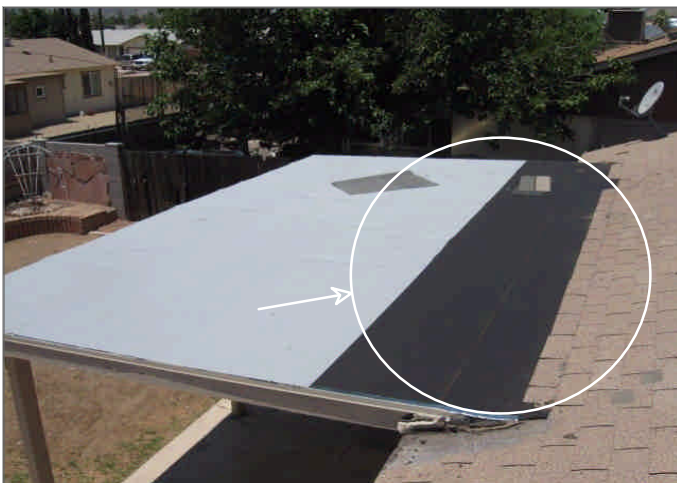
A strip of roofing material is missing and should be installed to forestall moisture entry
